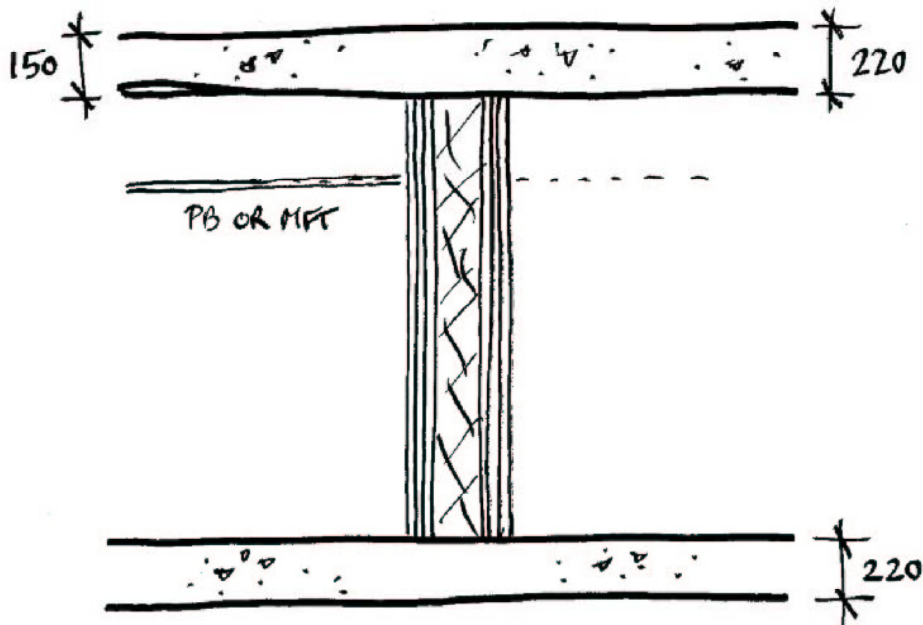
Grade 4 Construction Arrangement Options - Drywall
